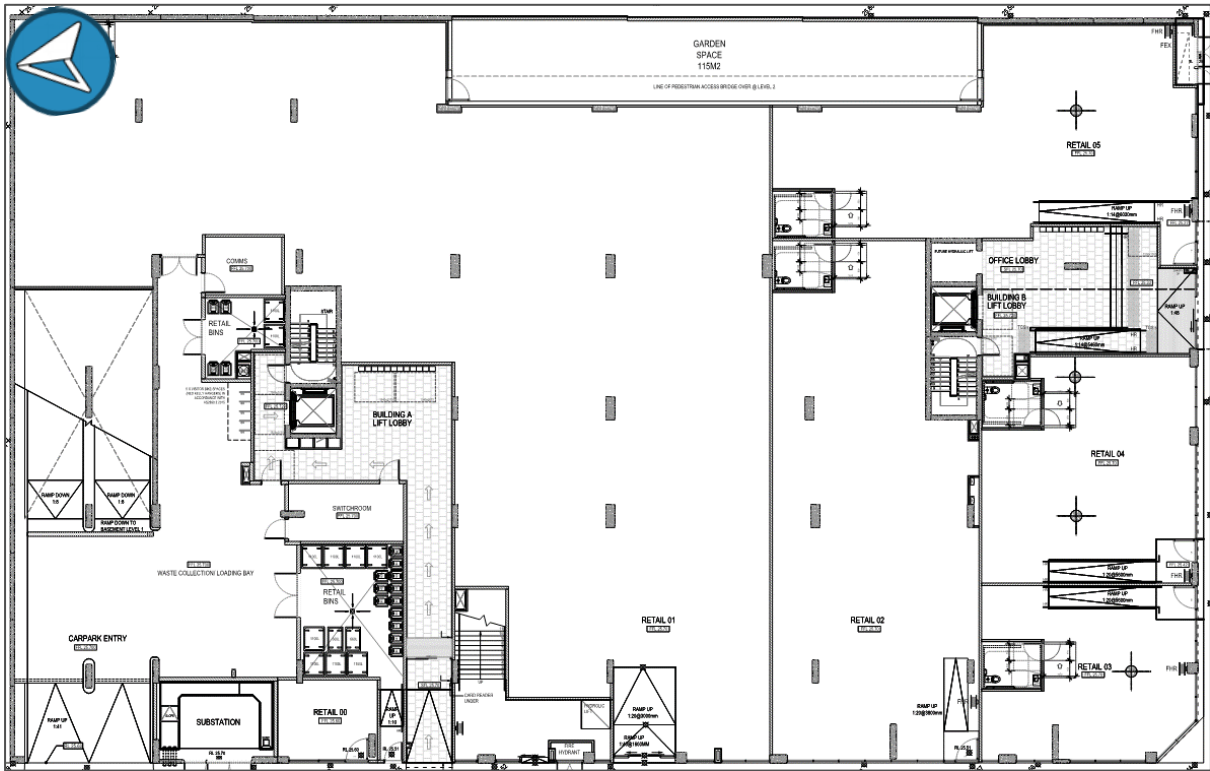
Proposed Floor Plans – Ground Level (Image Source: Artisan Architects)
